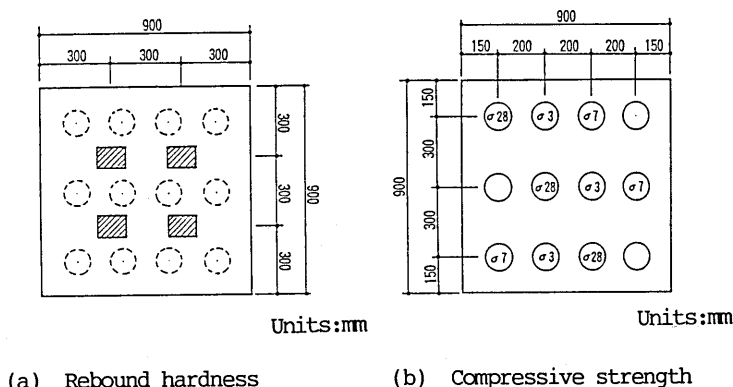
Location of Rebound Hardness and Compressive Strength Measurement Locations (Plan)
